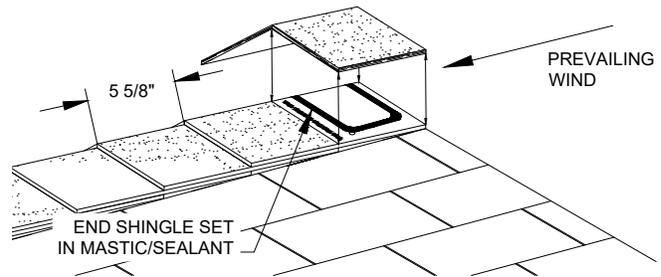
Installation of RidgeFlex® Shingles; End Cap Set in Mastic
